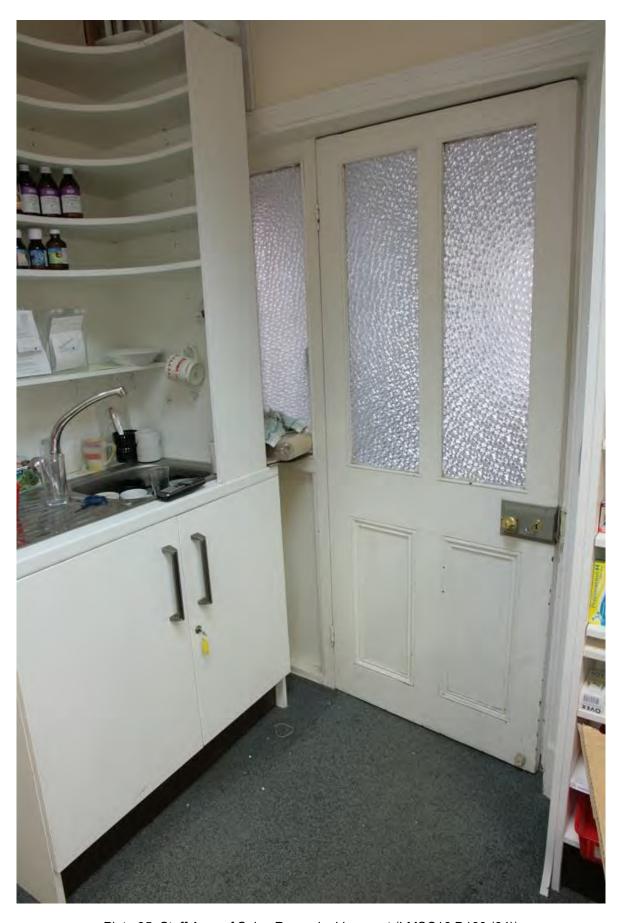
Staff Area of Sales Room, looking west (LMSC16 D100 (34))
